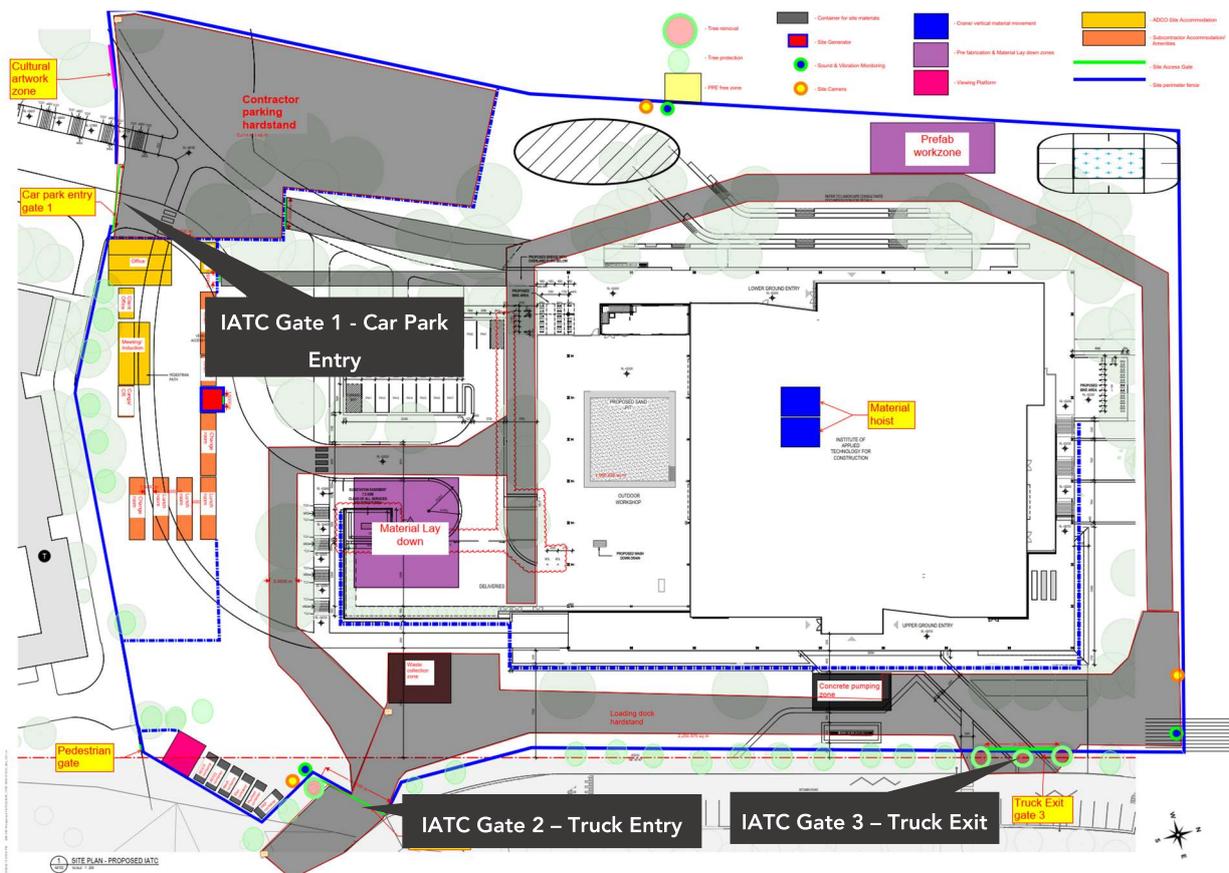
Site Establishment Plan (Source: ADCO)
